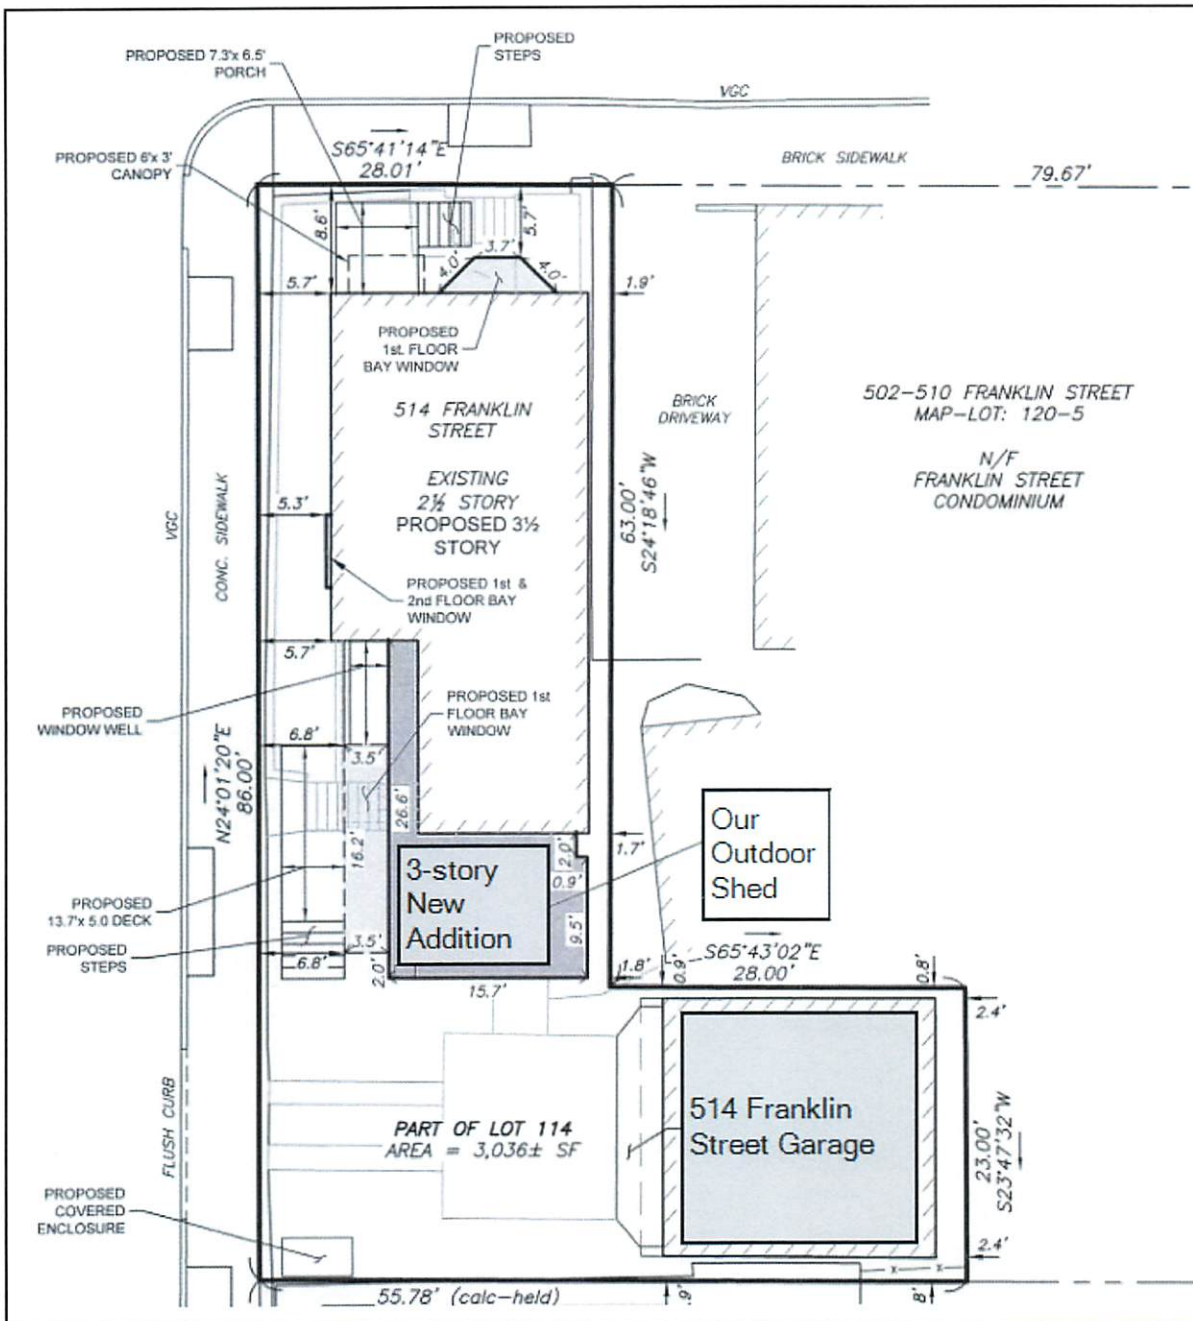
Our property will be enclosed by the existing garage/workshop and the new 3-story addition on the west side. Depriving it of air, light, and skyview.
